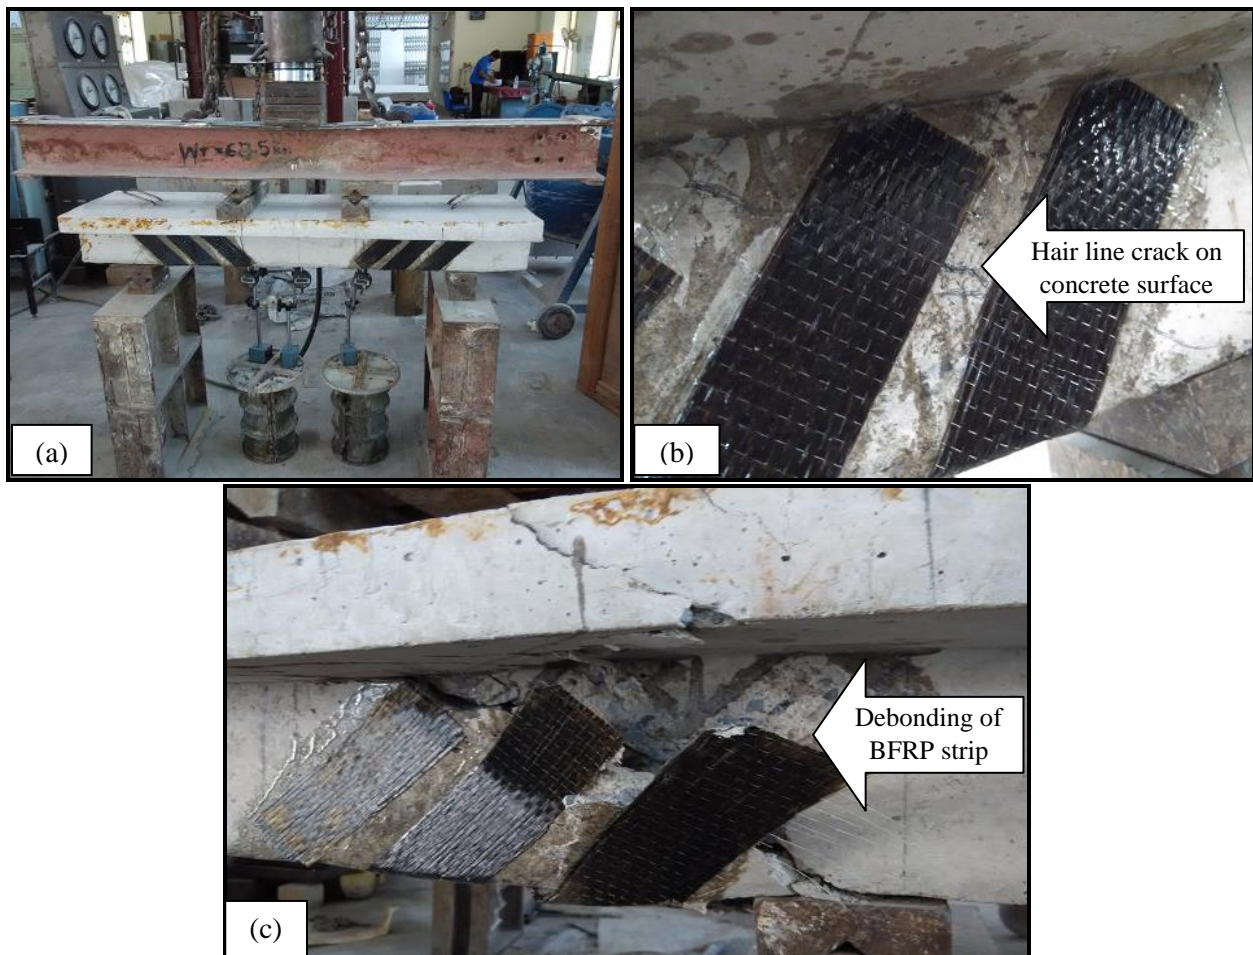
(a) Experimental Setup of beam SB9 under four-point loading system, (b) Hair line crack started in shear region at a load of 110kN, (c) Ultimate failure of beam SB9 by debonding of BFRP strip followed by diagonal shear crack
